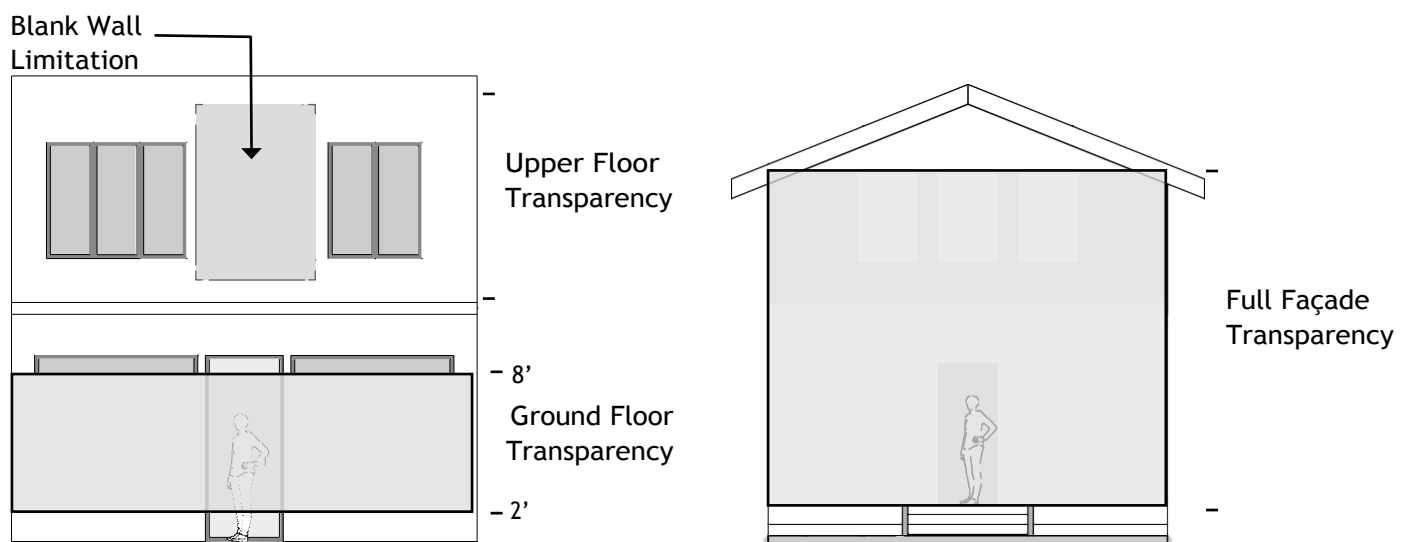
Measuring Transparency: Ground Floor, Upper Floor, & Full Façade
